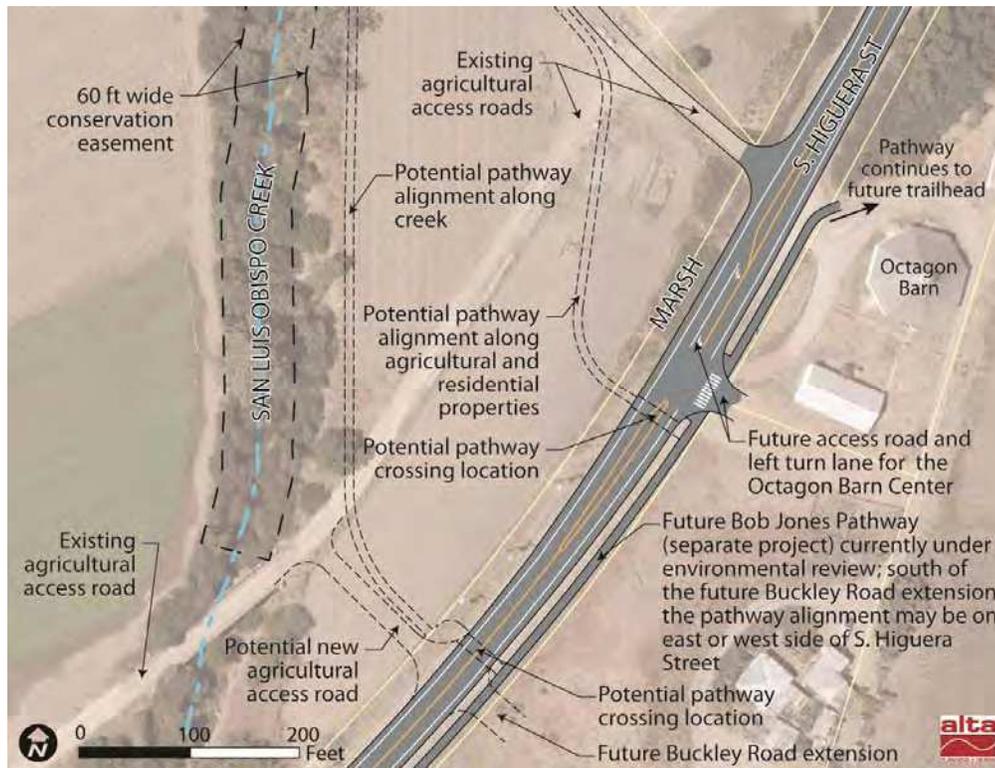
Potential Agricultural Access Road and Pathway Configurations (Showing the Planned Octagon Barn Center Access Road and Turn Lane and the County’s Bob Jones Pathway)
